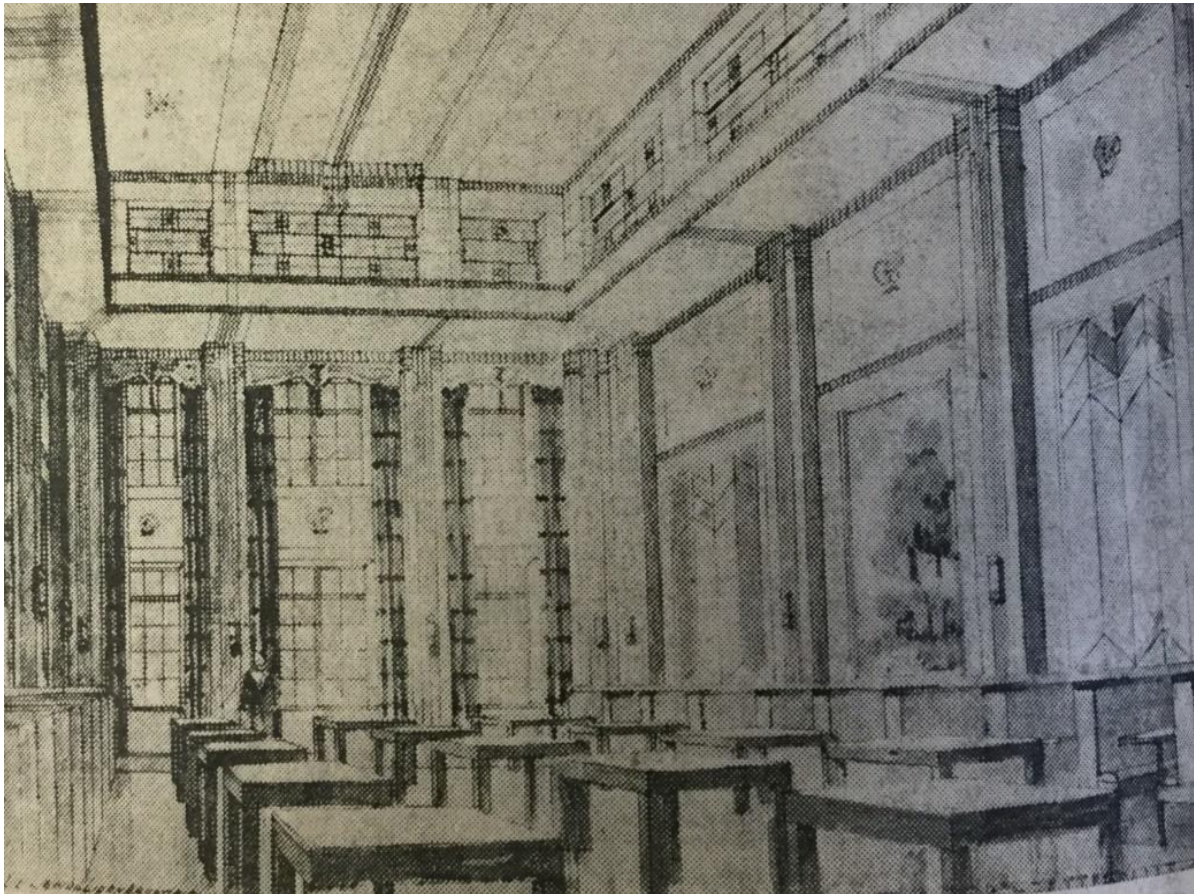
An early sketch of the proposed new Dining Hall. (Photo: *Courier-Mail*, 17 May 1938).
